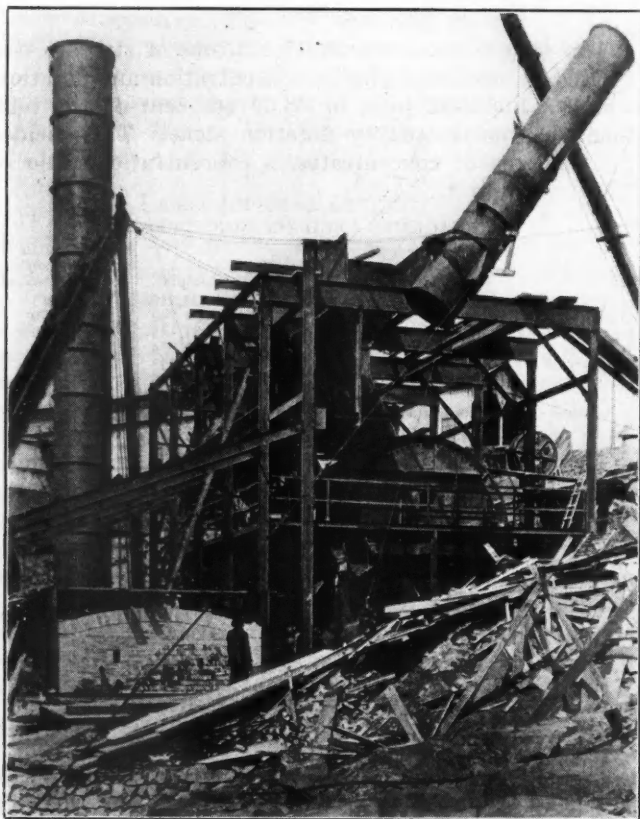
KNUDSEN FURNACE AND SETTLER UNDER CONSTRUCTION
